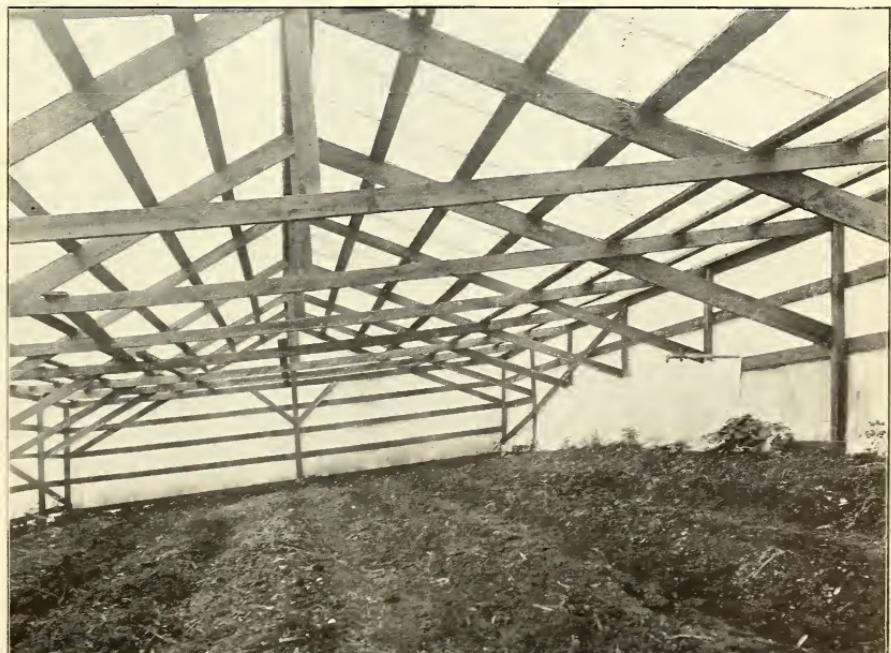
HAWAII STATION—INTERIOR OF NEW PLANT HOUSE, SHOWING CONSTRUCTION.
